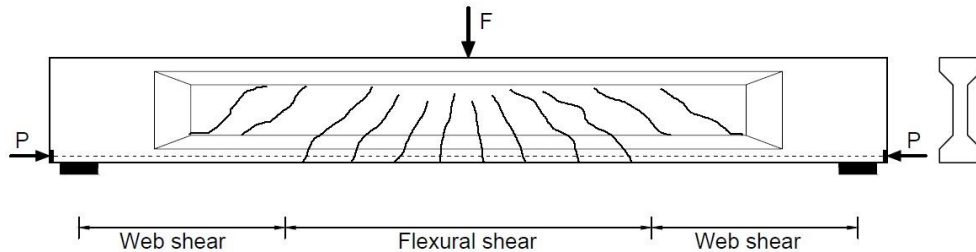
Types of shear cracks in prestressed girder (ACI Committee 318, 2011)
